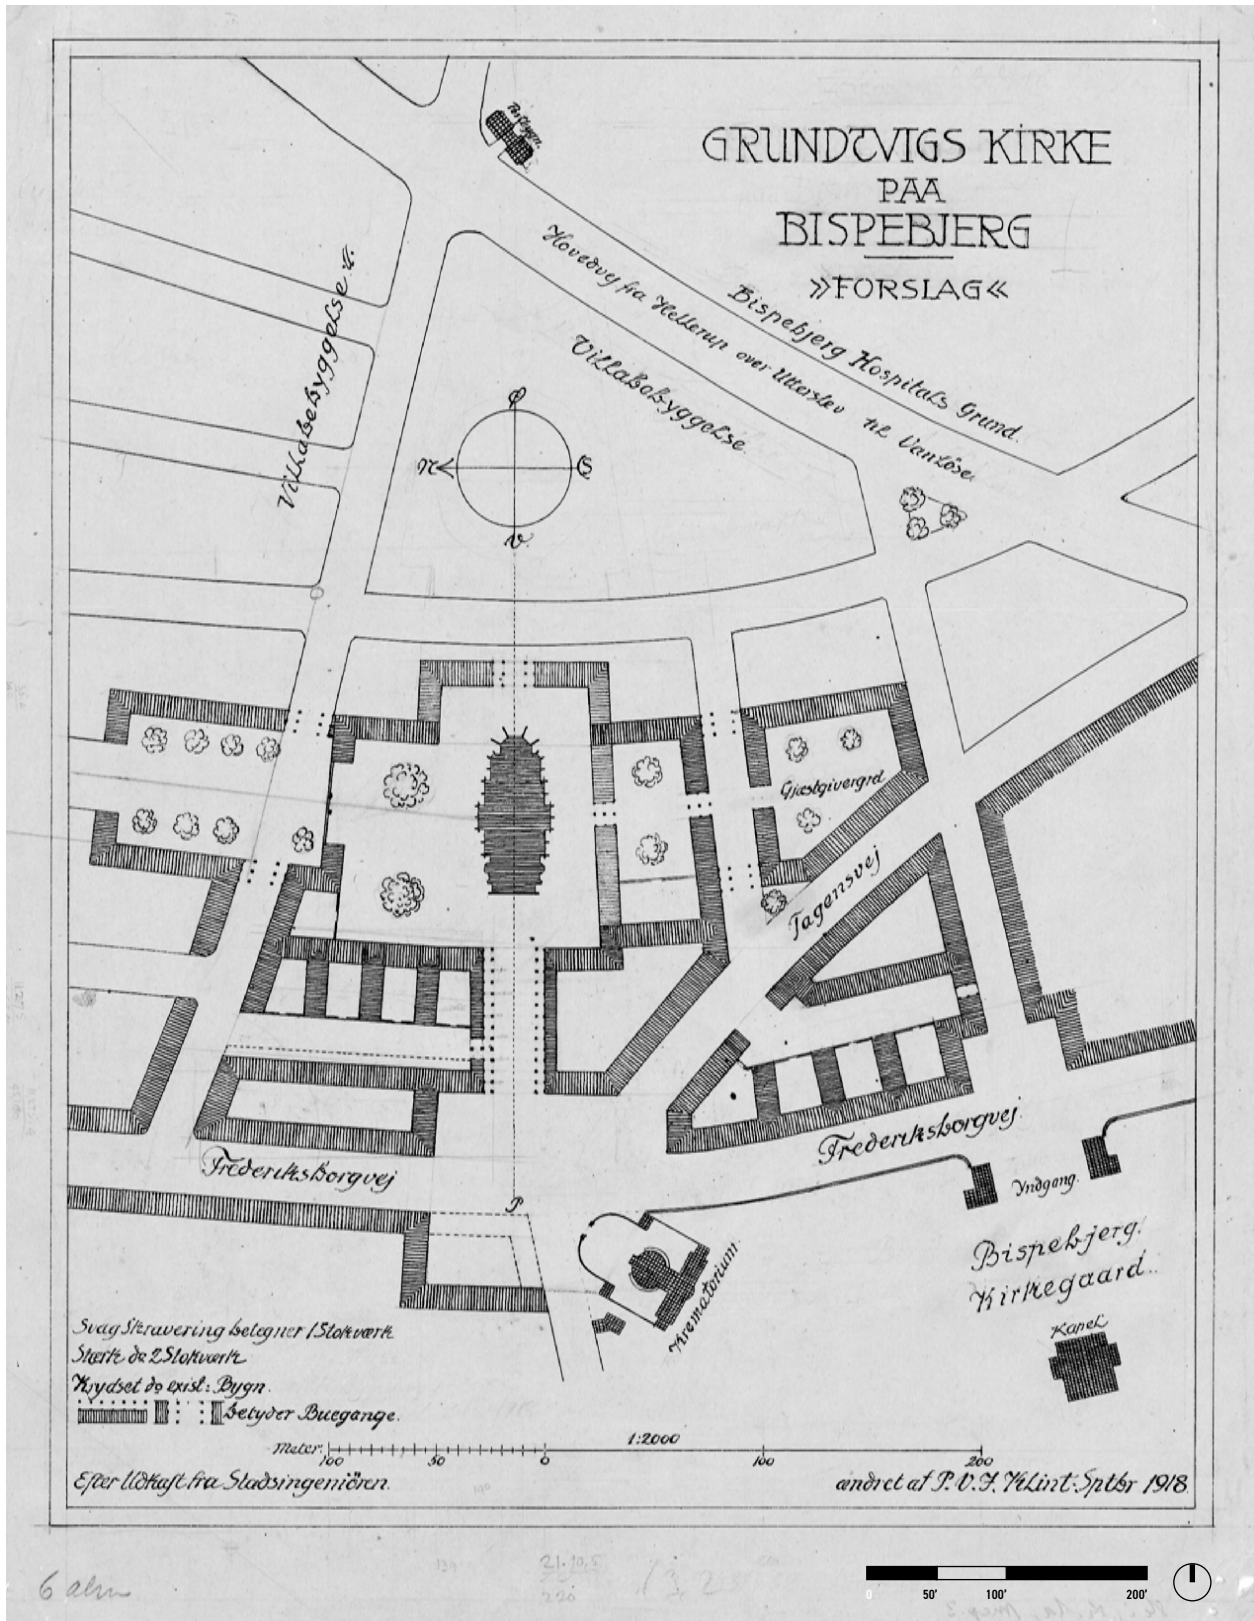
P.V. Jensen-Klint, plan of På Bjerget, Grundtvig's Church, Copenhagen, 1940.
